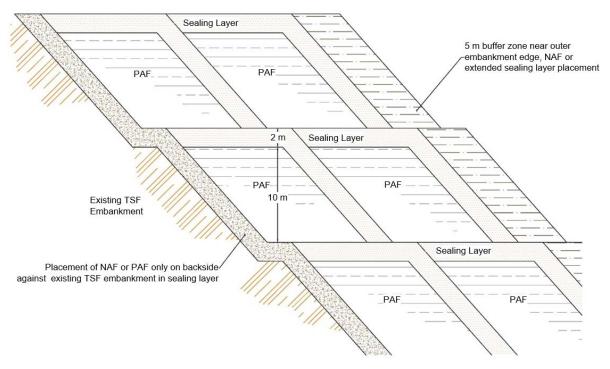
Example of MRS construction approach incorporating multiple PAF mine rock zones encapsulated by low permeability NAF sealing layers.
